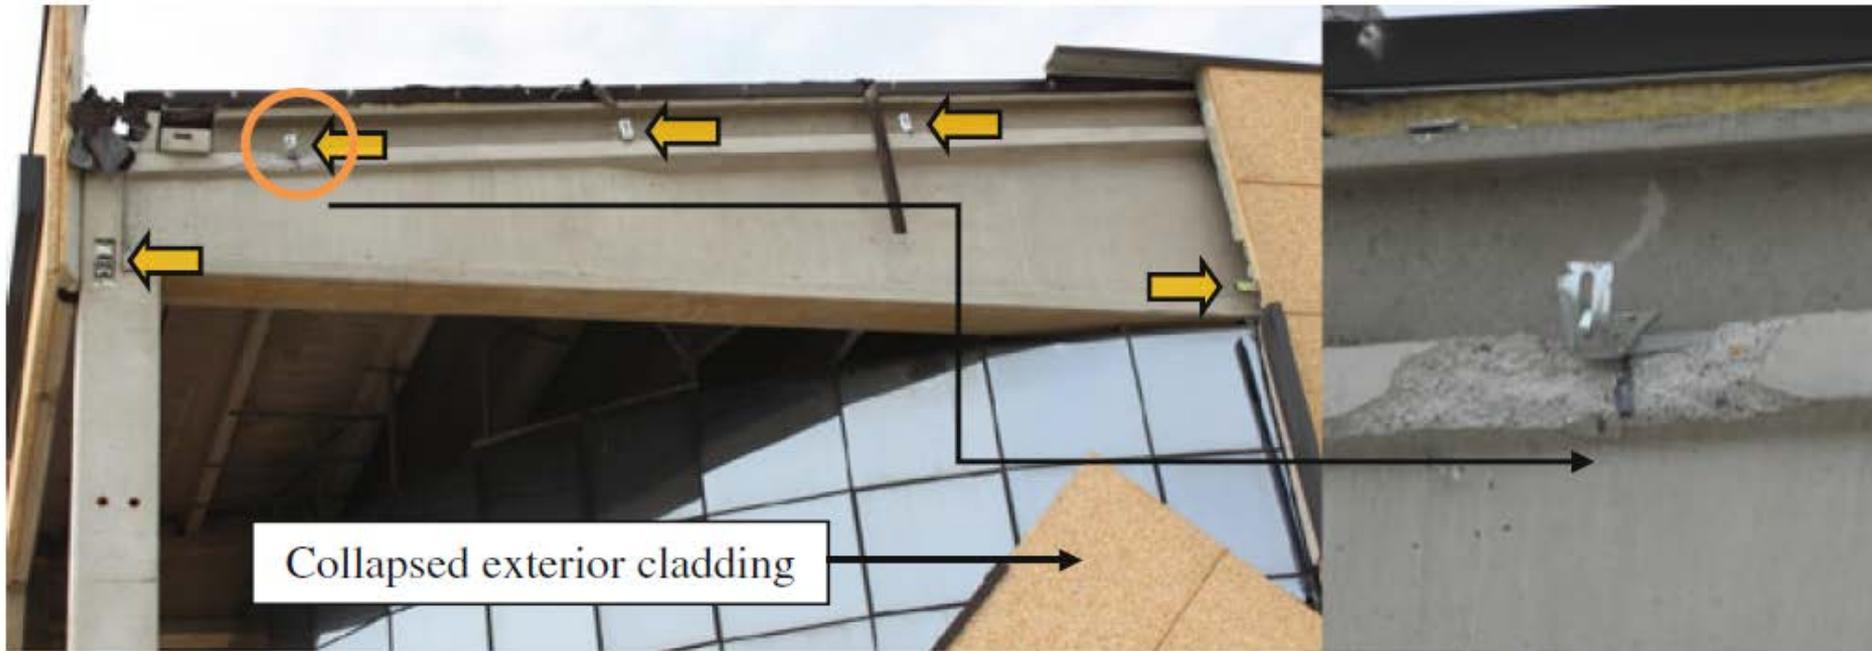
Details of the failure of the fastening system (made with anchor channels)
